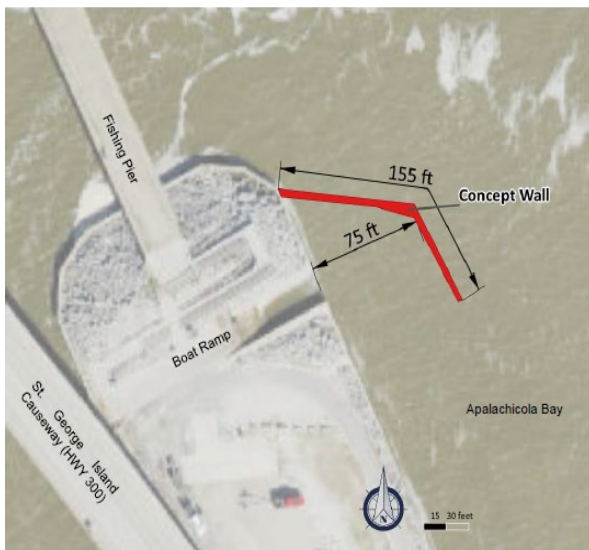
Concept sketch of the proposed wave wall structure relative to the existing boat basin.
